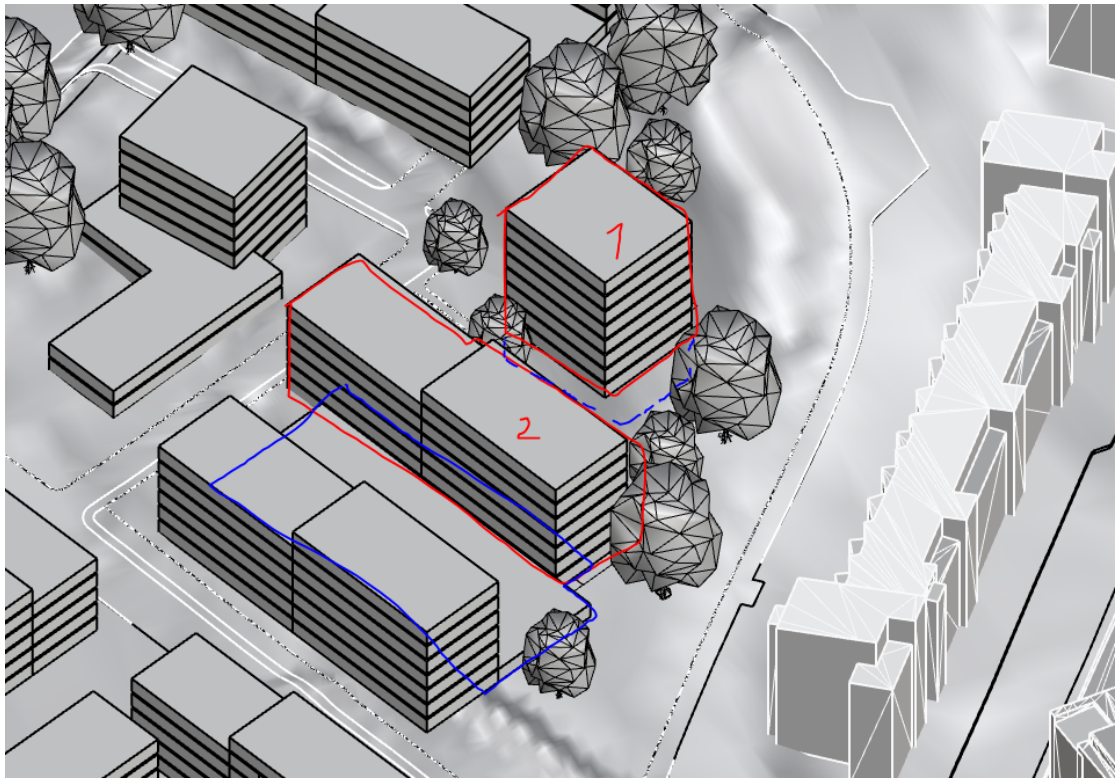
Site overview, from Kaminsky Arkitektur AB.
